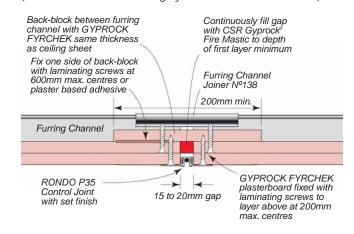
CONTROL JOINT PARALLEL TO STEEL FRAMING – 3 LAYERS
